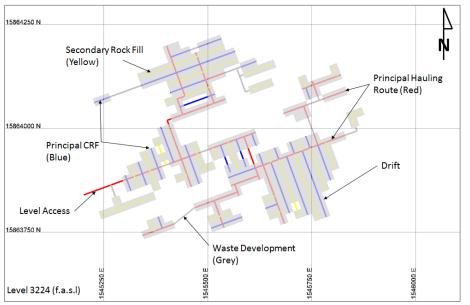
Proposed Drift and Fill Design for the 3224 Level
